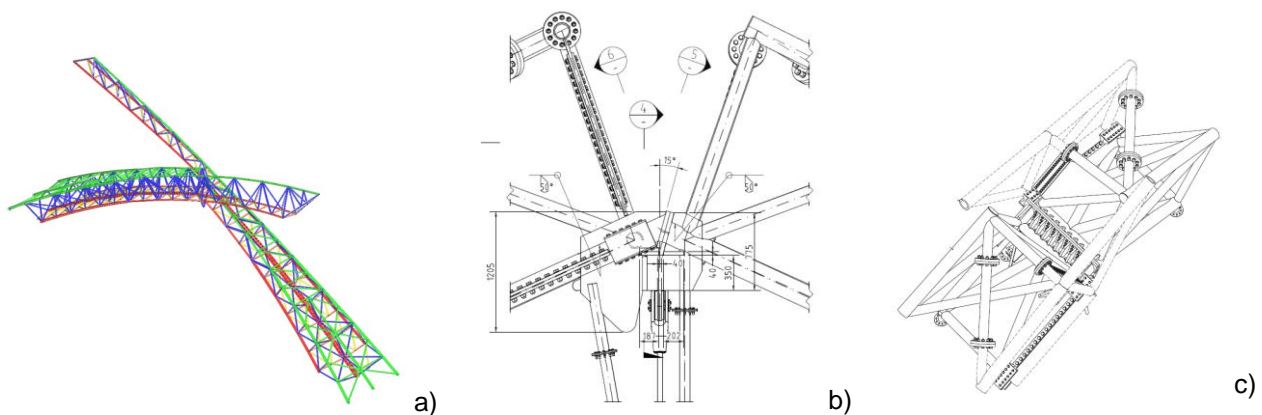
Connection in the top of the main arches: a) Mathematical model, b) and c) 2D and 3D view of the connection detail from the drawings
